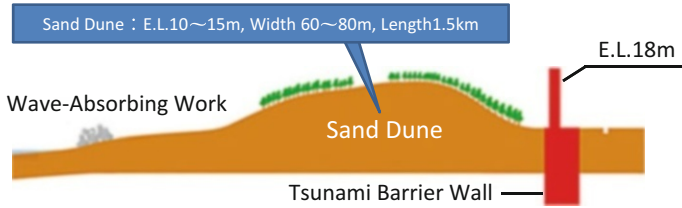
Construction of tsunami barrier wall (Hamaoka nuclear power plant)
